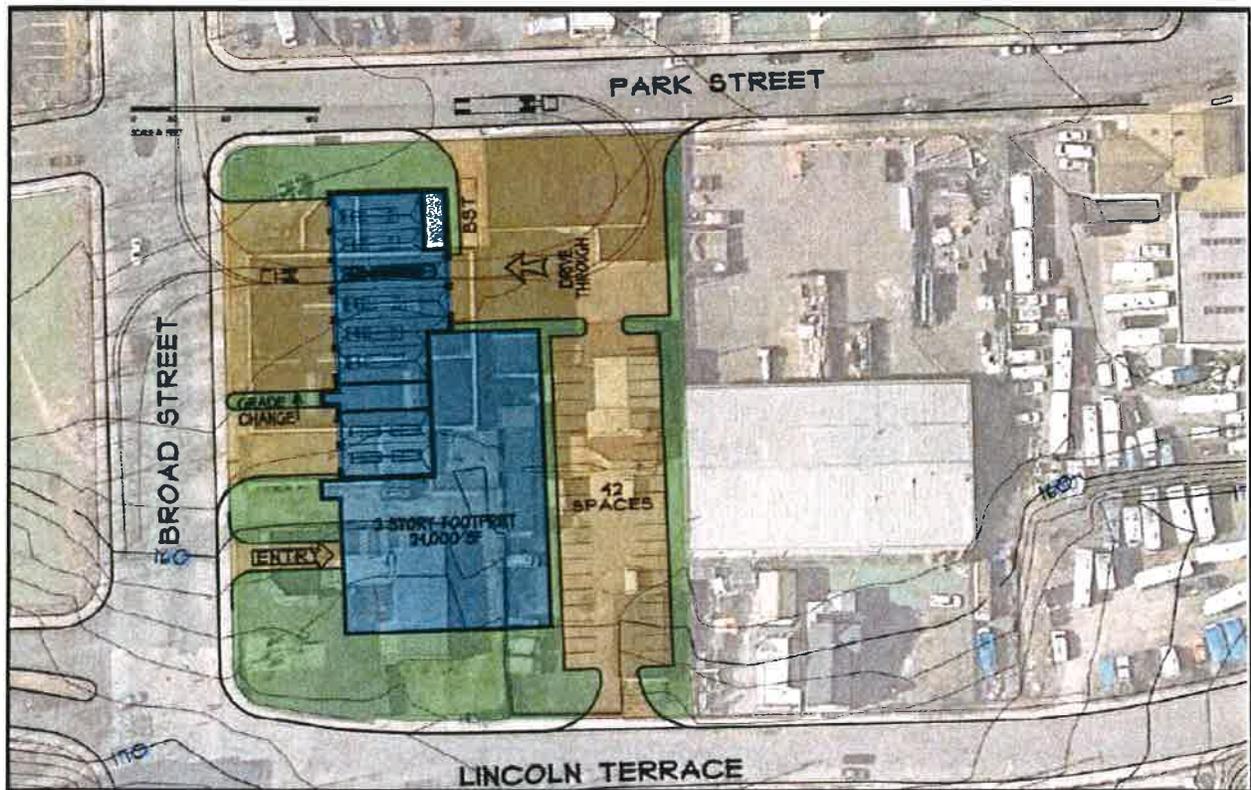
Design Study / Conceptual Site Layout, Lincoln Terrace Site
